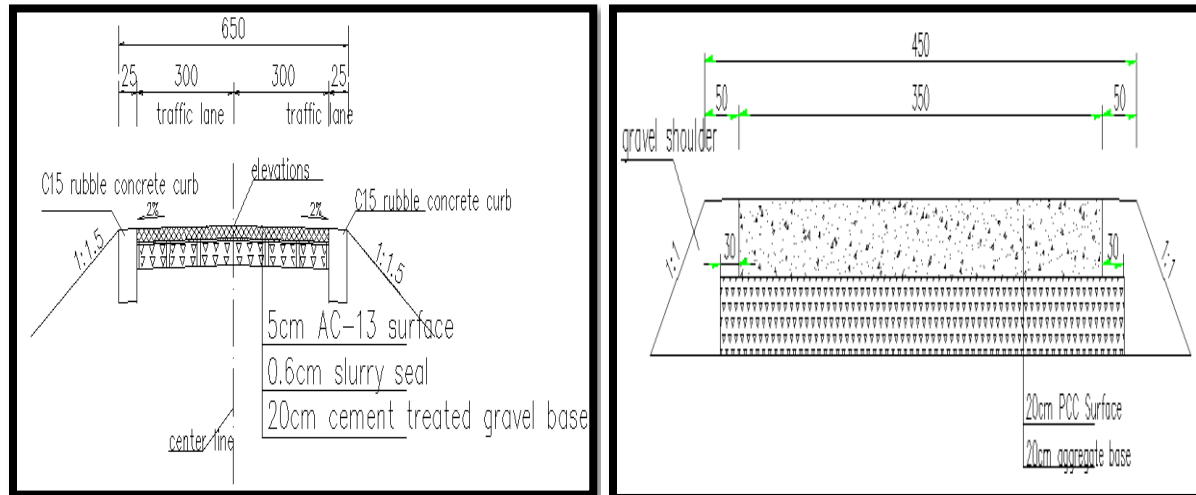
Asphalt Concrete and Cement Concrete Road Design
